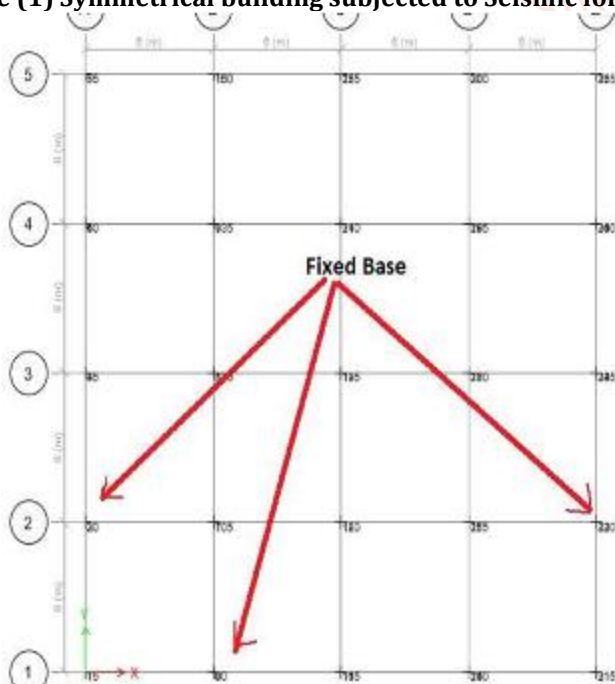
Plan View of G+13 Square Shaped Structure without LRB
